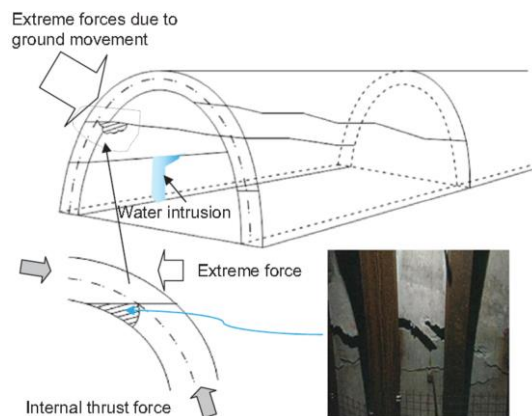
Example of tunnel failure due to the ground movement [12].
